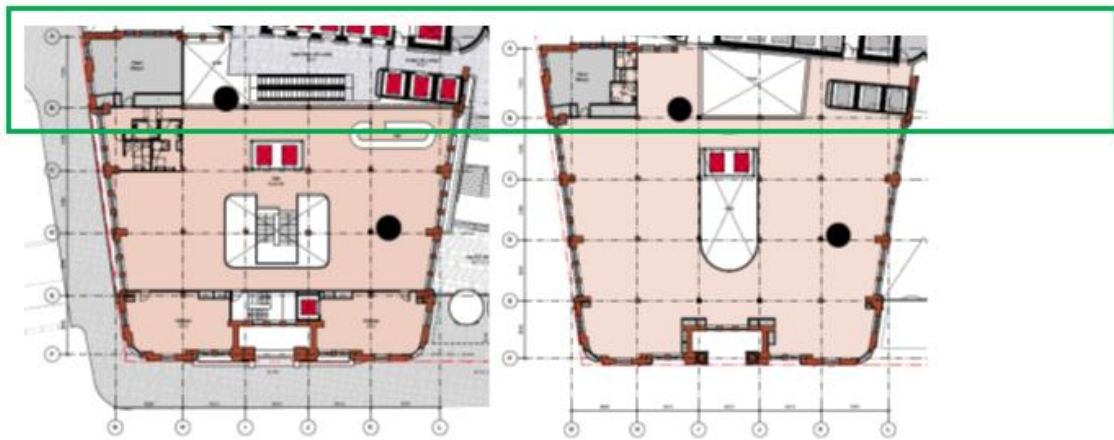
Ground floor plan (left) and Levels above ground level (right) with area of concern outlined in green
